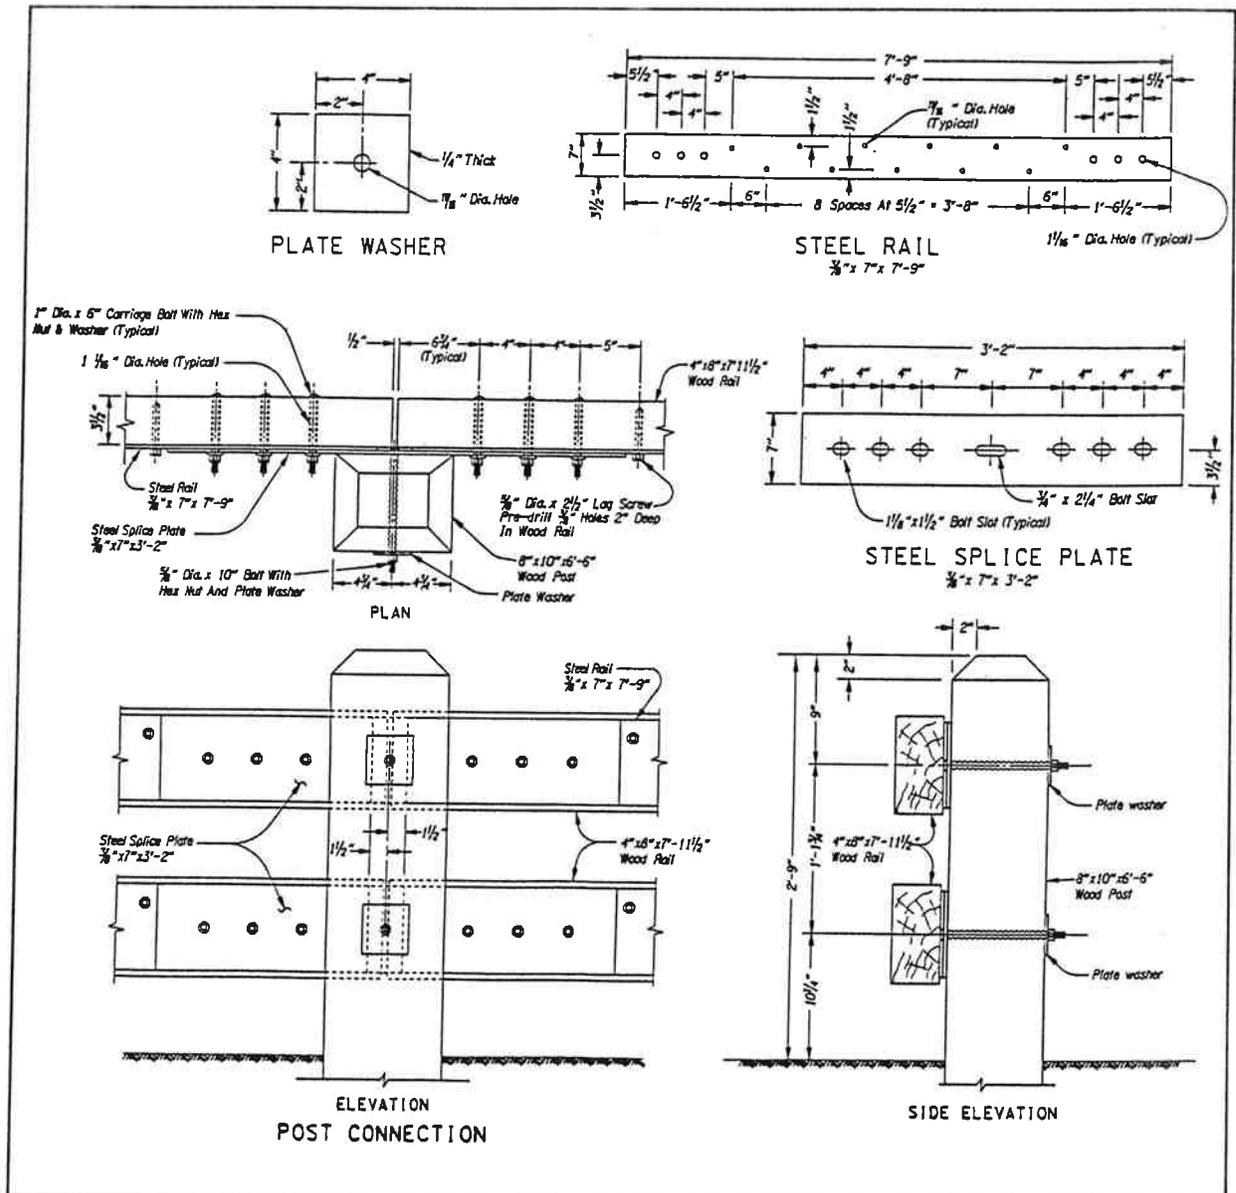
Two-Rail Steel-Backed Timber Guardrail Connection
